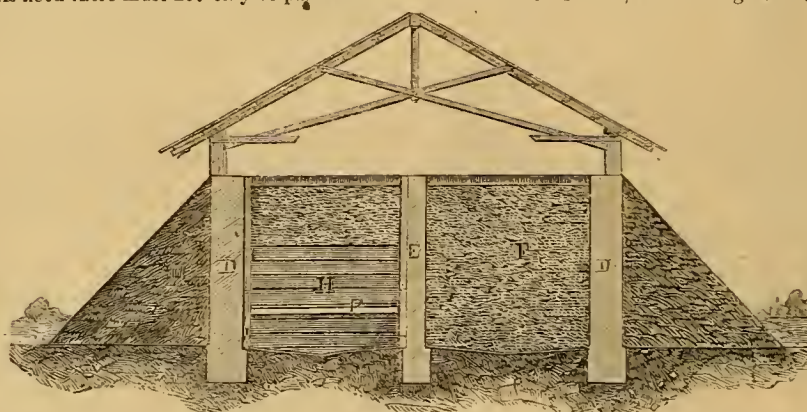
END VIEW OF PIT ABOVE GROUND.
